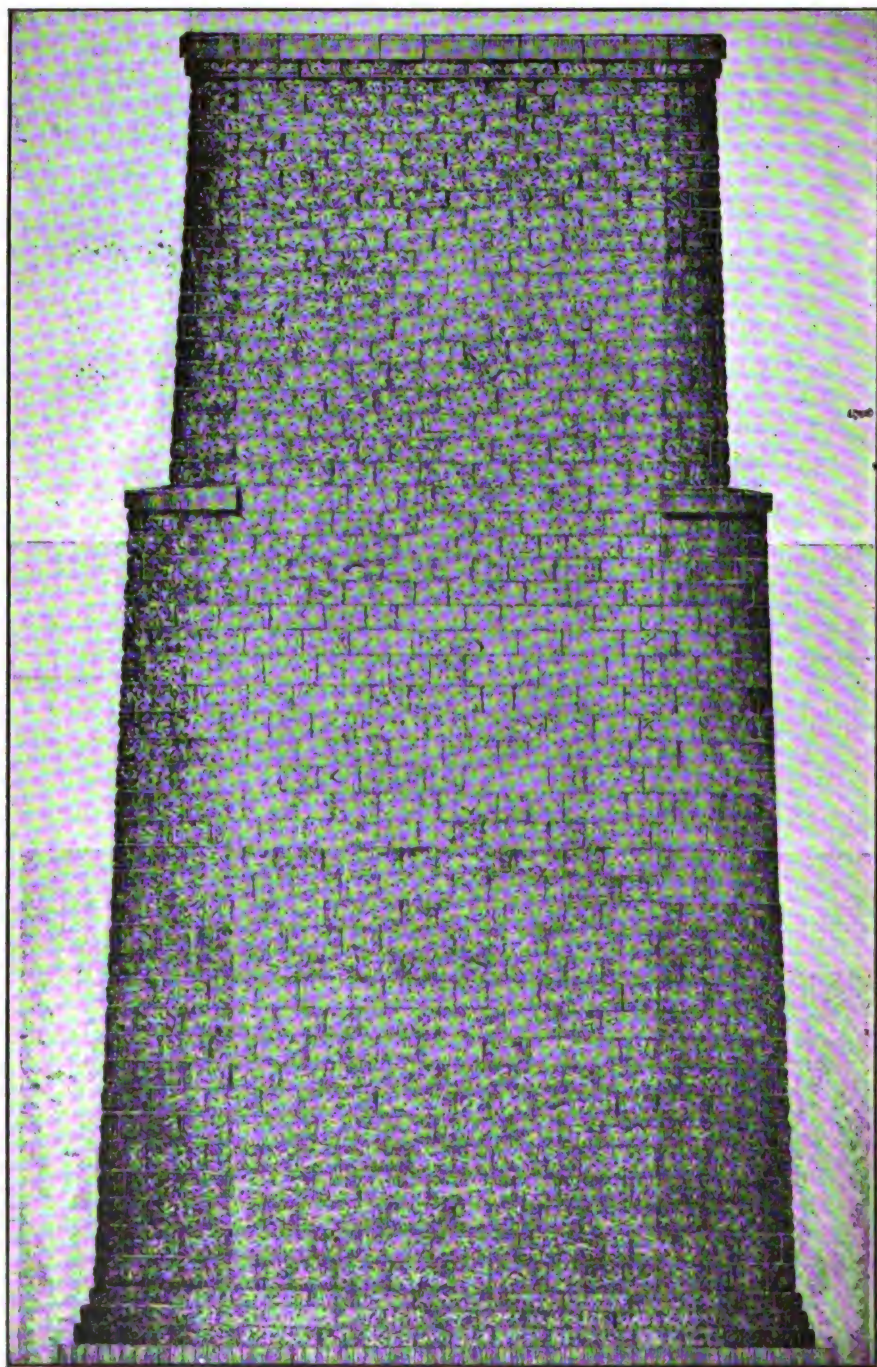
PIER OF OMAHA BRIDGE, UNION PACIFIC SYSTEM.
